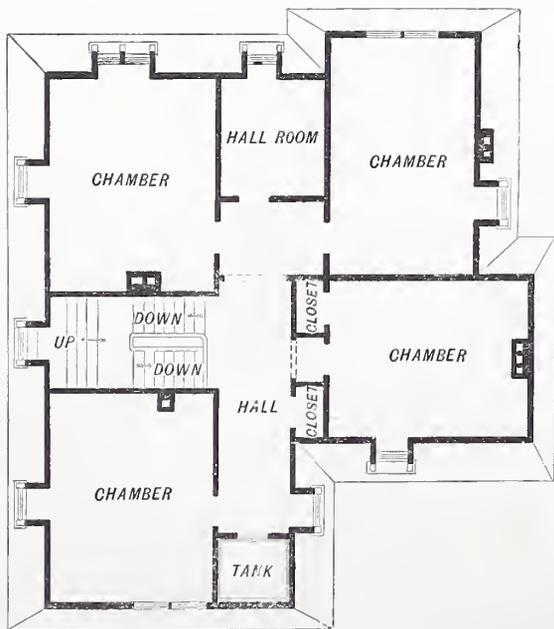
Attic Plan.—Scale, 1-16 Inch to the Foot.
